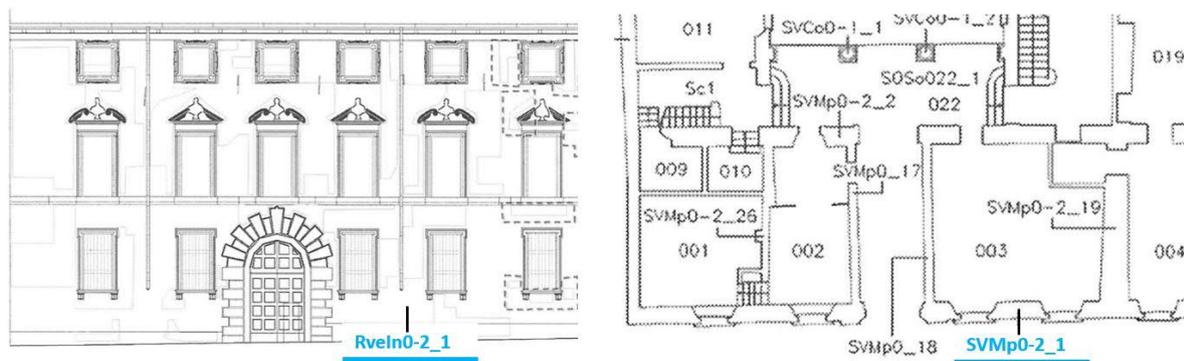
Example of different classification of the same wall between elevation (Exterior cladding - RveIn) on the left. And plan (load bearing wall - SVMp) on the right
